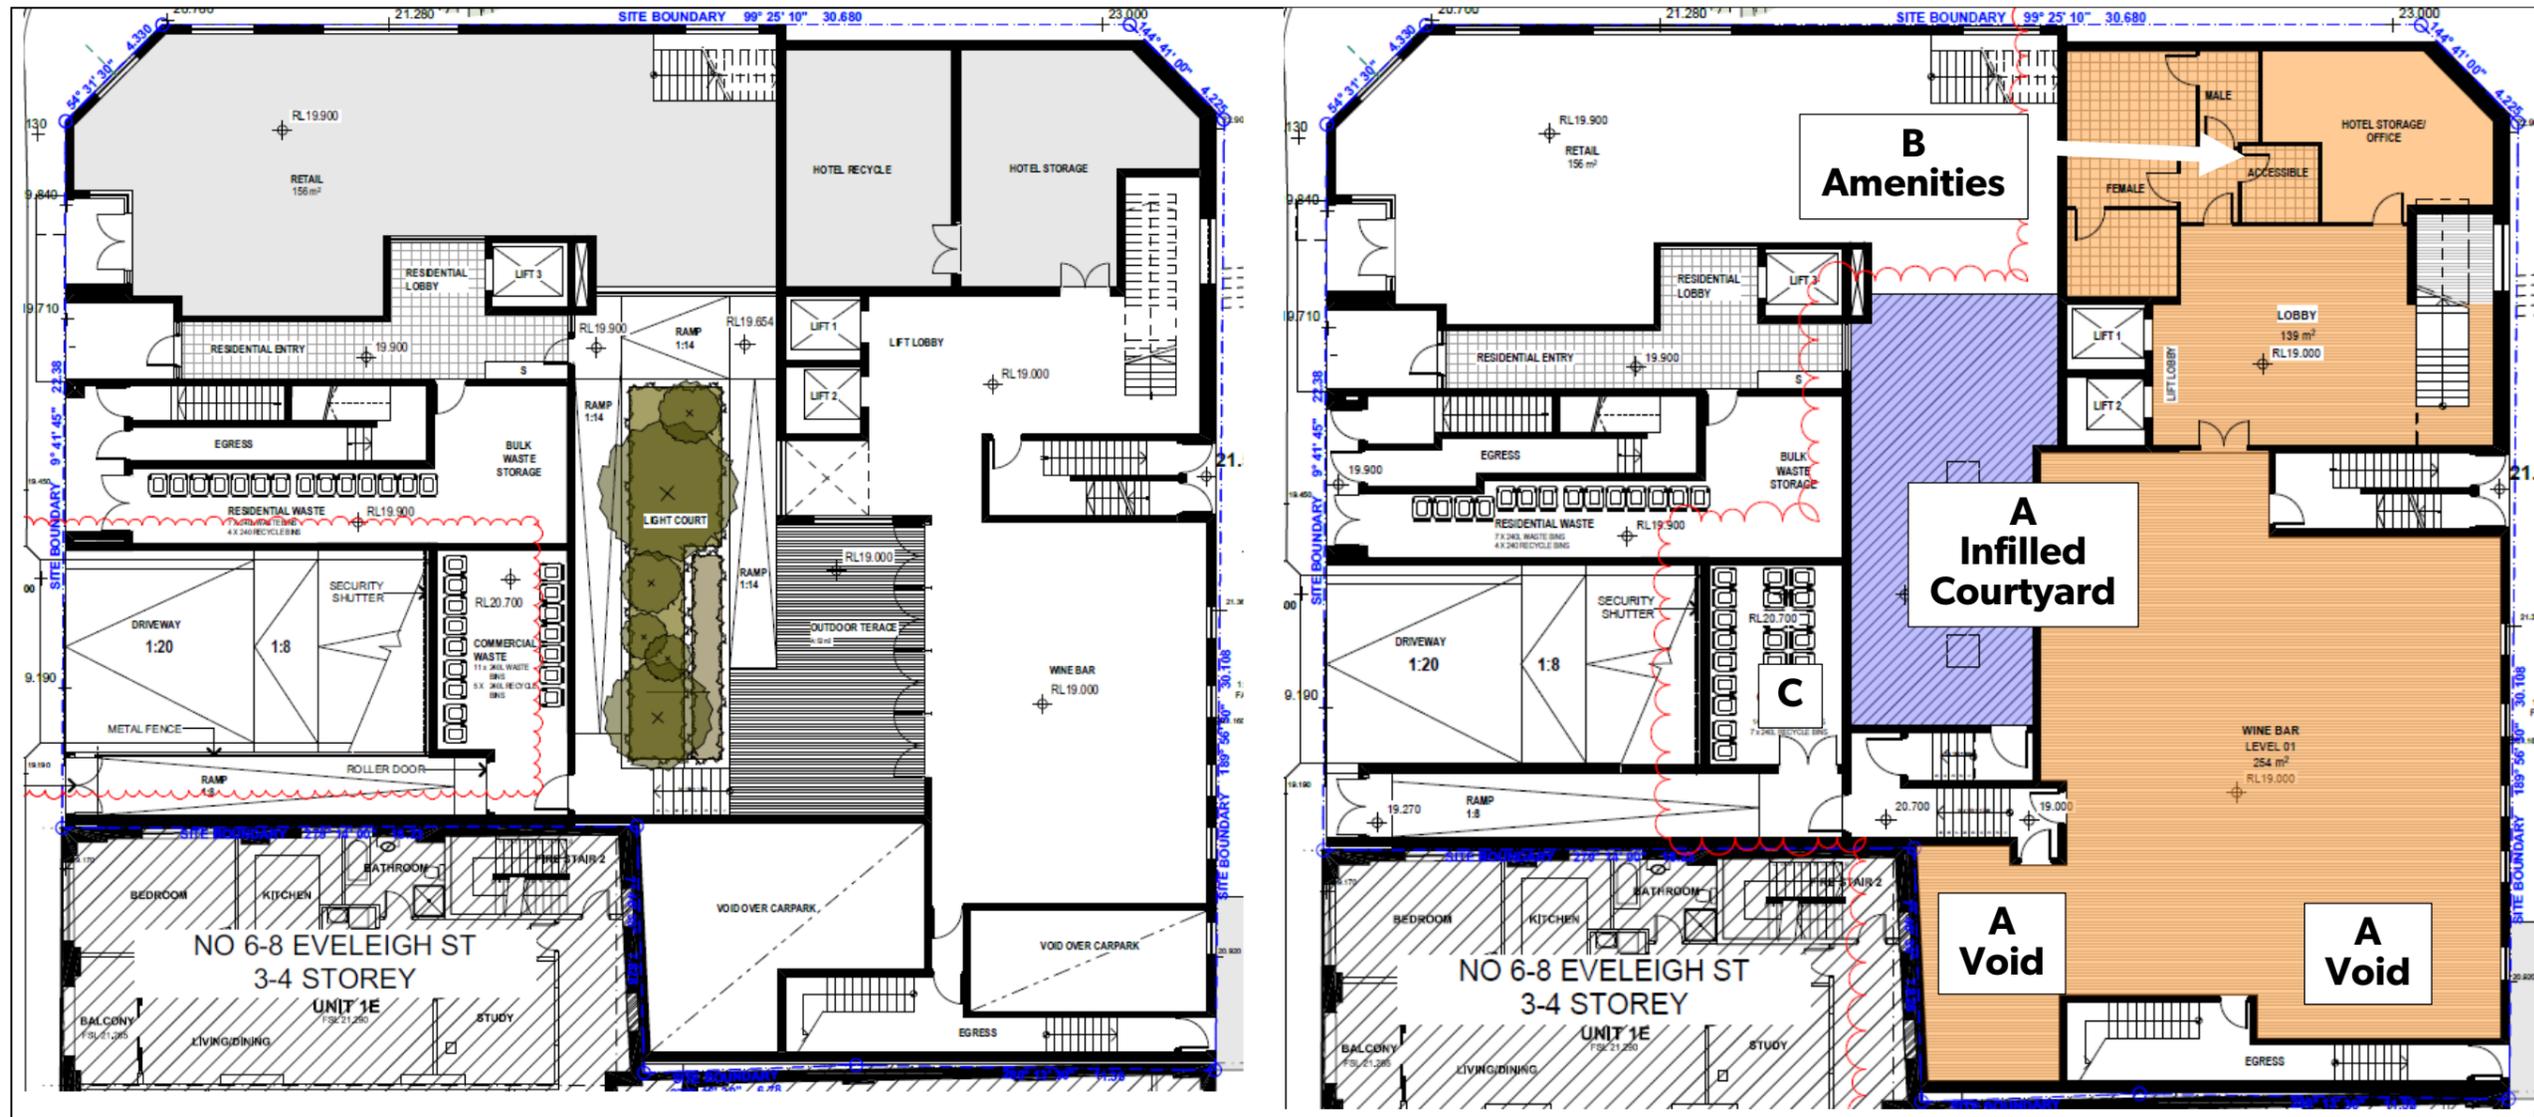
| Ground / level 1 floor plan comparison between approved (left) and proposed (right) (Source: Approved Plan and Applicant's EIS 2018)
